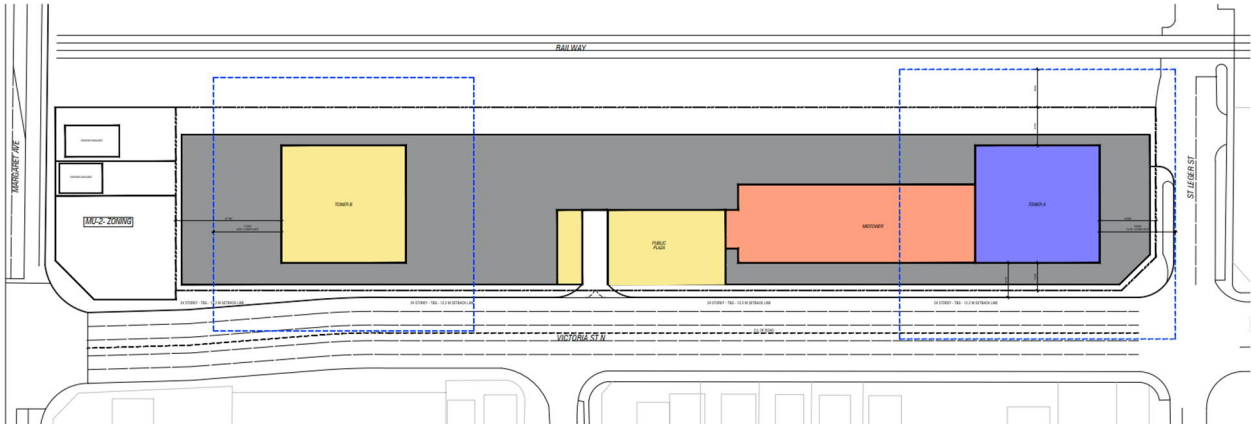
Site Plan of the Proposed Development Provided by Renders Law, Architecture, Engineering
